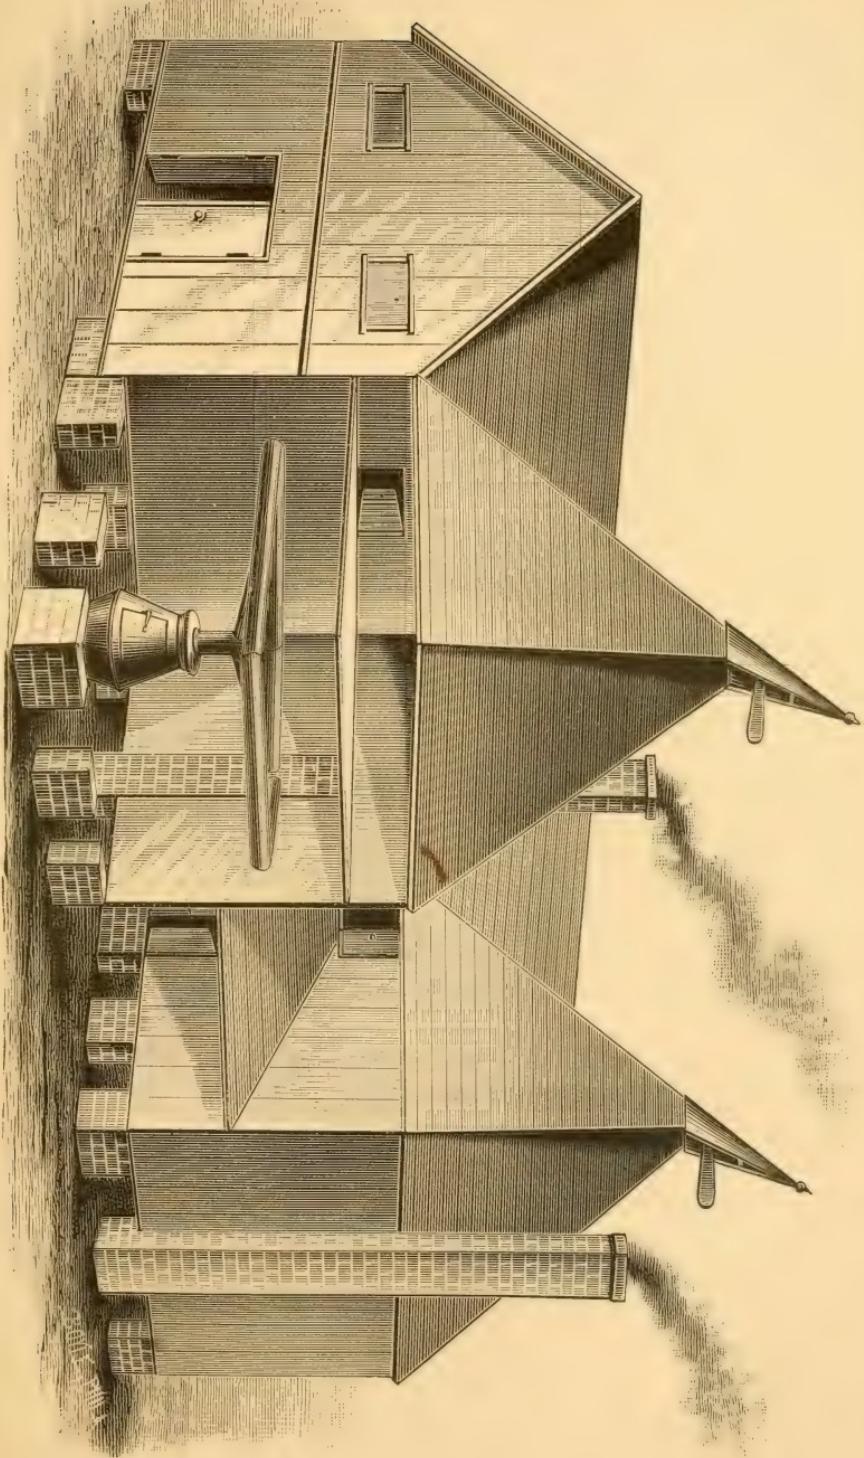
MODERN APPROVED NEW YORK STATE HOP KILN.
